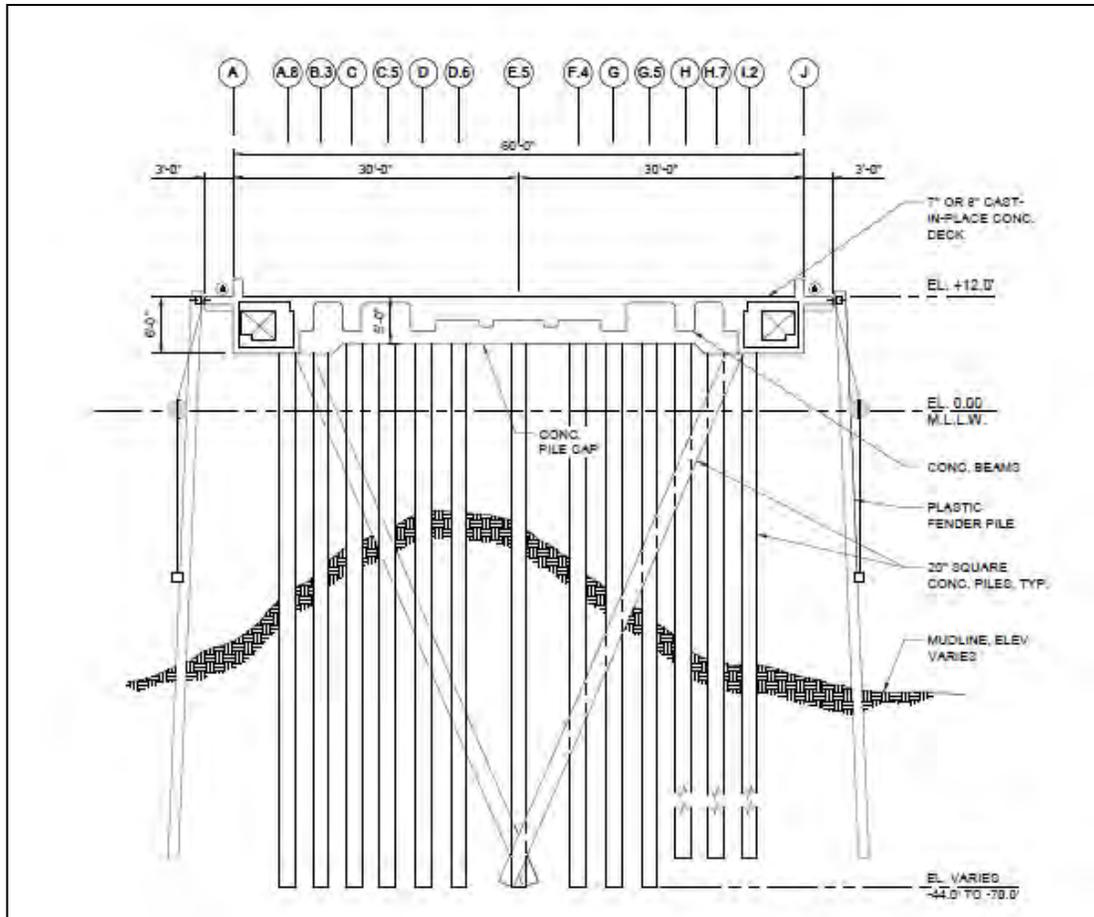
Existing Cross-Section of Pier 6 (typical)
